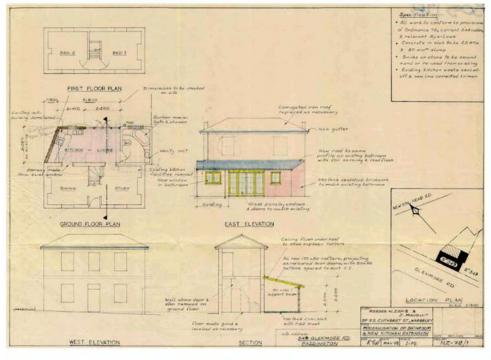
BA1978/509 which approved ground floor level alterations and additions to accommodate a new kitchen living area and bathroom refresh.
